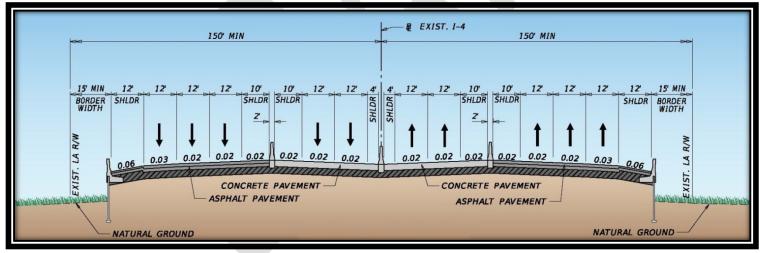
Proposed Typical Section (6+4 without rail envelope) – SR 528 to W. of SR 435
